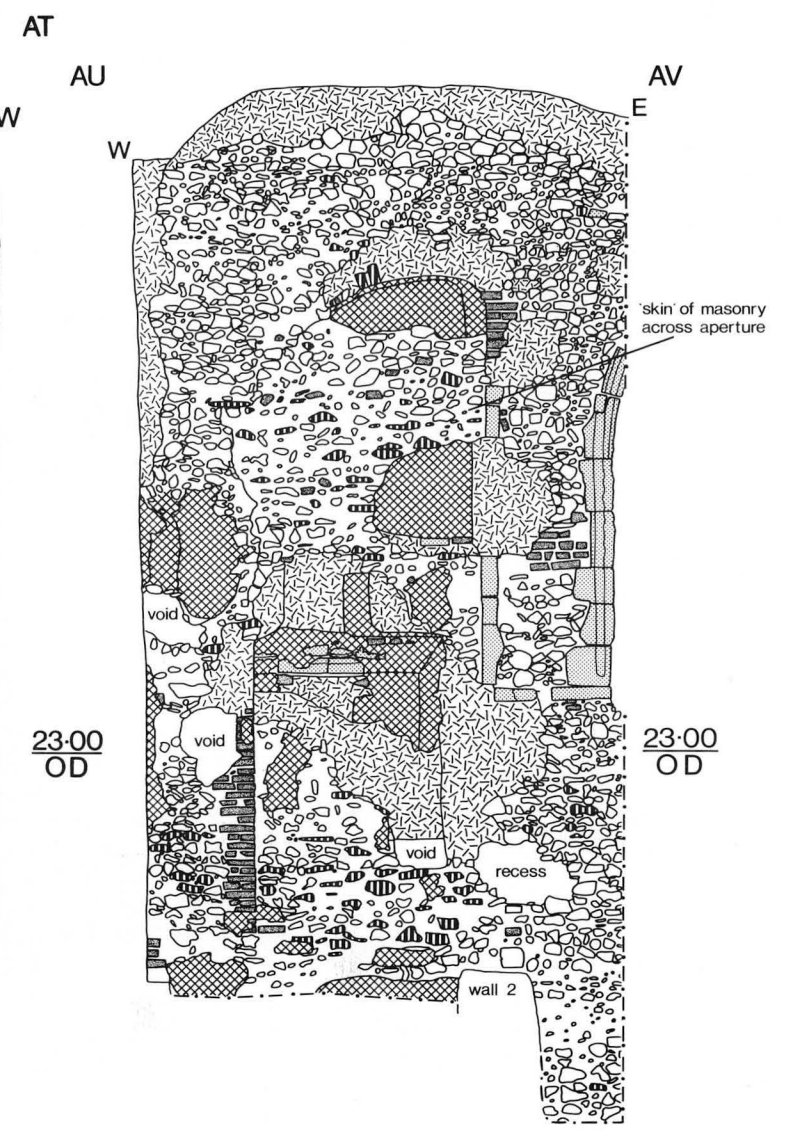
Detail of elevation AU-AV of interior north wall of the chancel. Scale 1:50
